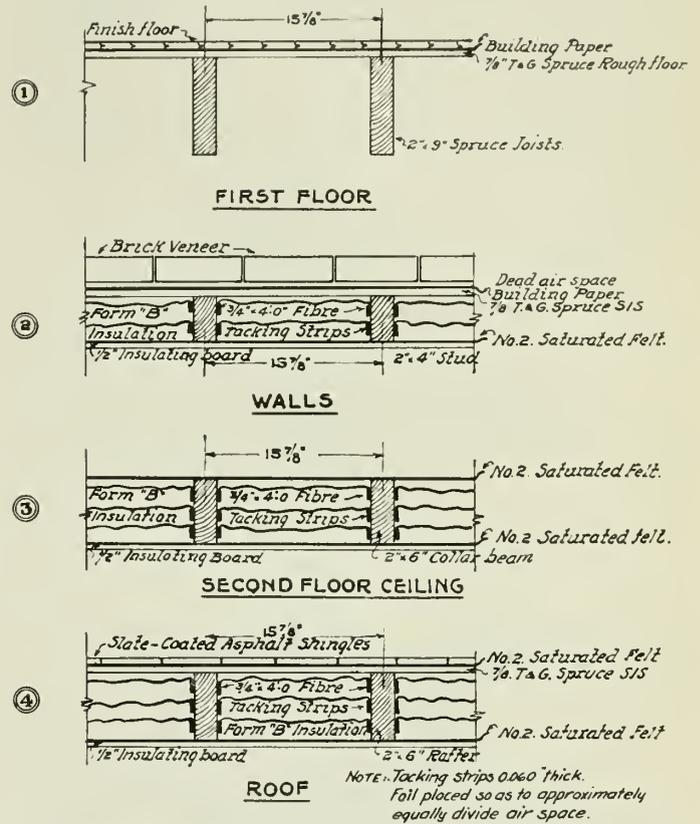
Method of Installing Form B Insulation with Brick Veneer Construction.
